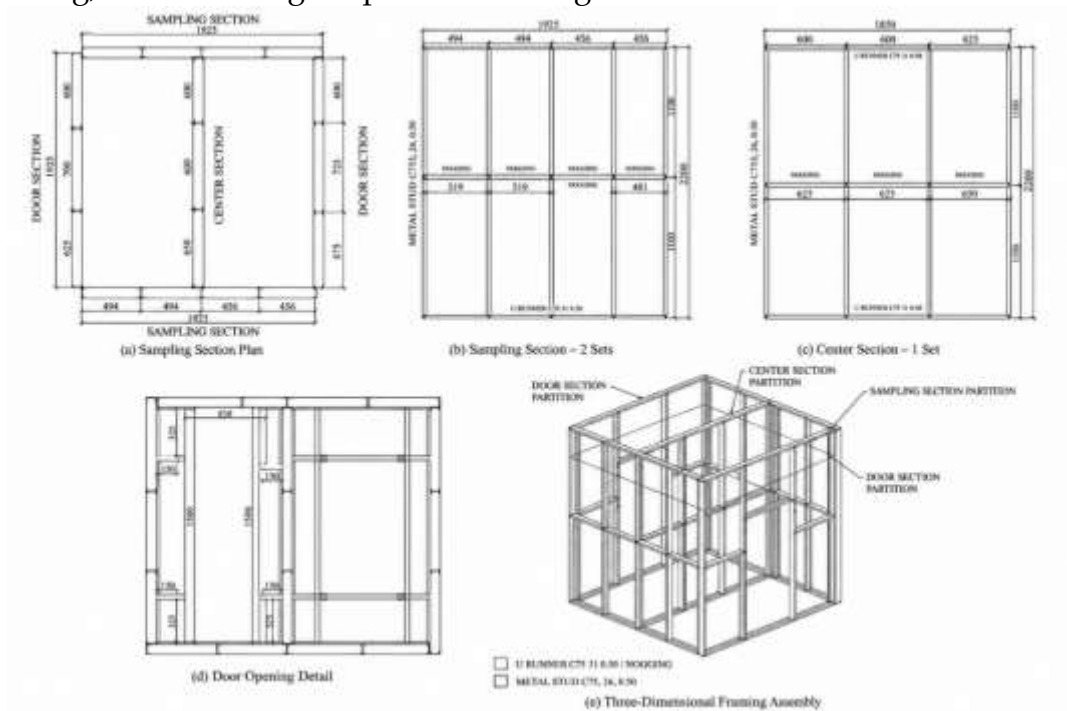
a) Section A-A Figure; b) Section B-B Figure; c) Section C-C; d) Section D-D; and e) Final Design of Frame Installation Using Light Steel Construction
